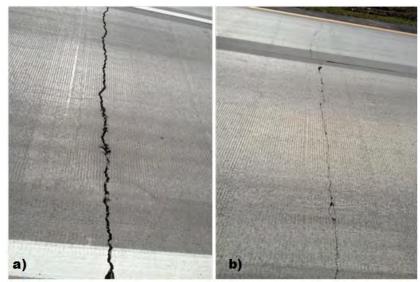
Cracks on Bonded Overlay: a) a wide crack; b) regular shrinkage crack
